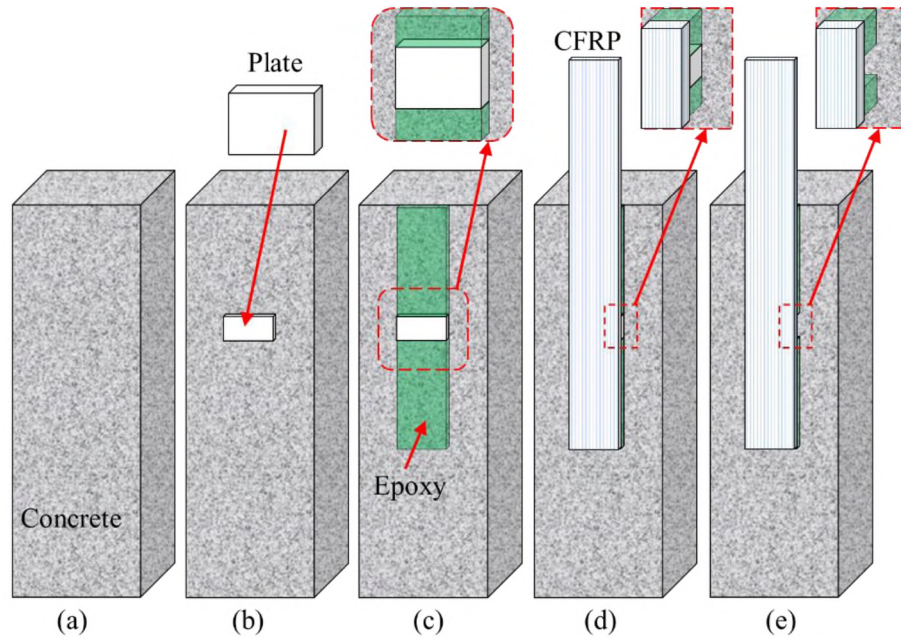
Construction of CFRP-concrete joints: (a) concrete prism, (b) attach tap or plate at predefined location of defects, (c) apply epoxy, (d) apply CFRP sheets, and (e) remove the plate before the hardening of epoxy (for Specimen AMT-CFRP-D-1).
